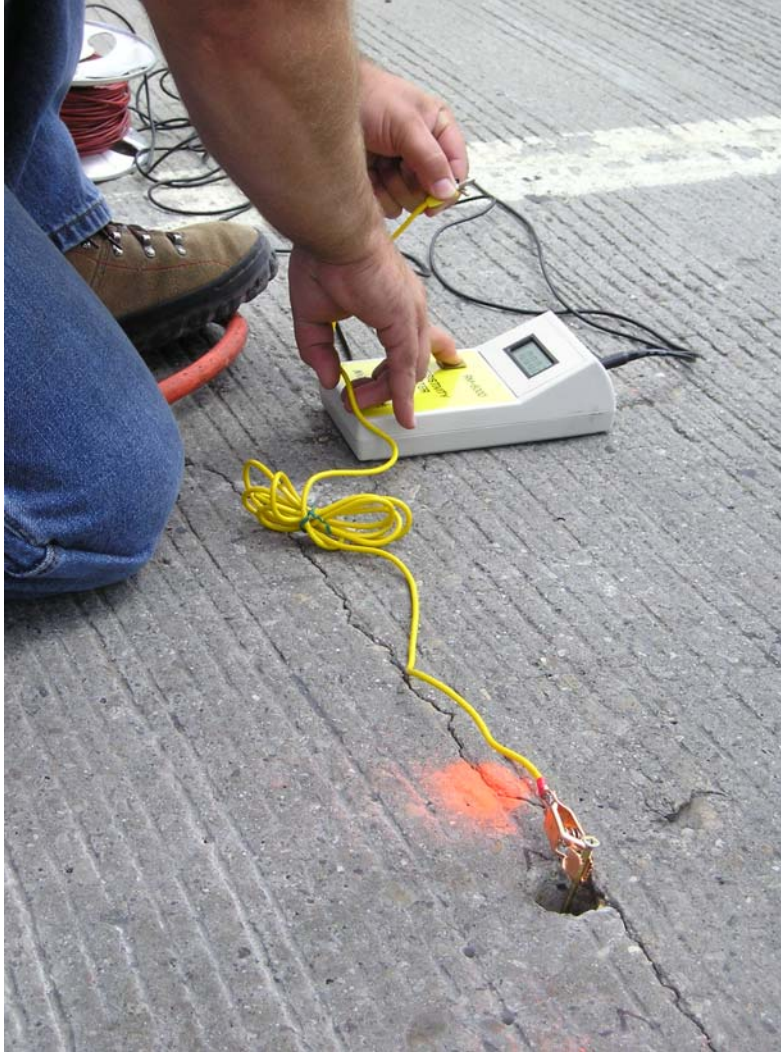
Drilling to expose the steel reinforcement.
